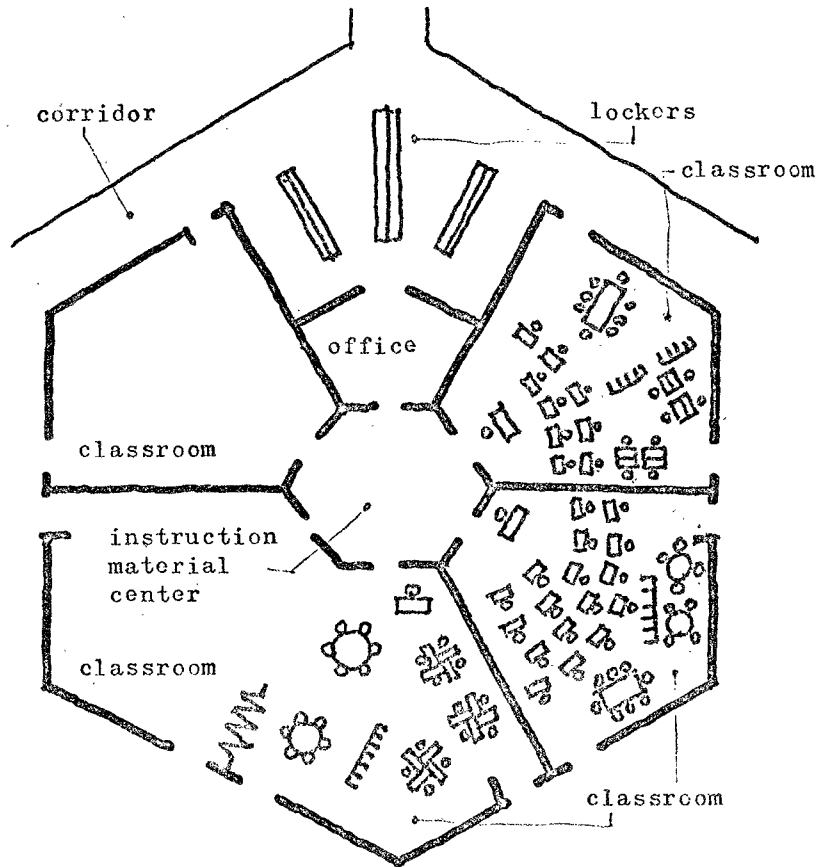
Scheme of A Hexagonal Cluster divided to Triangular or Trapezoid Classrooms
